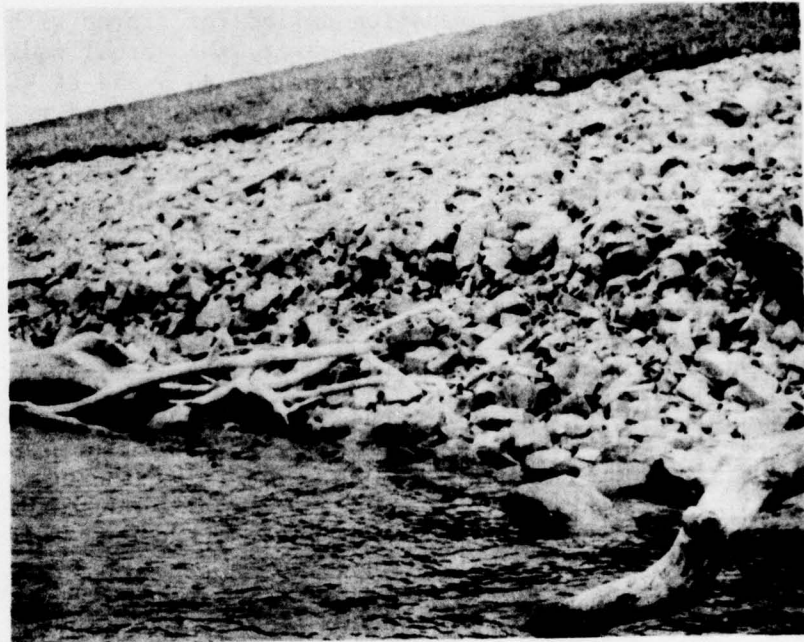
Storm damage to riprap embankment during 1967 and 1968.
